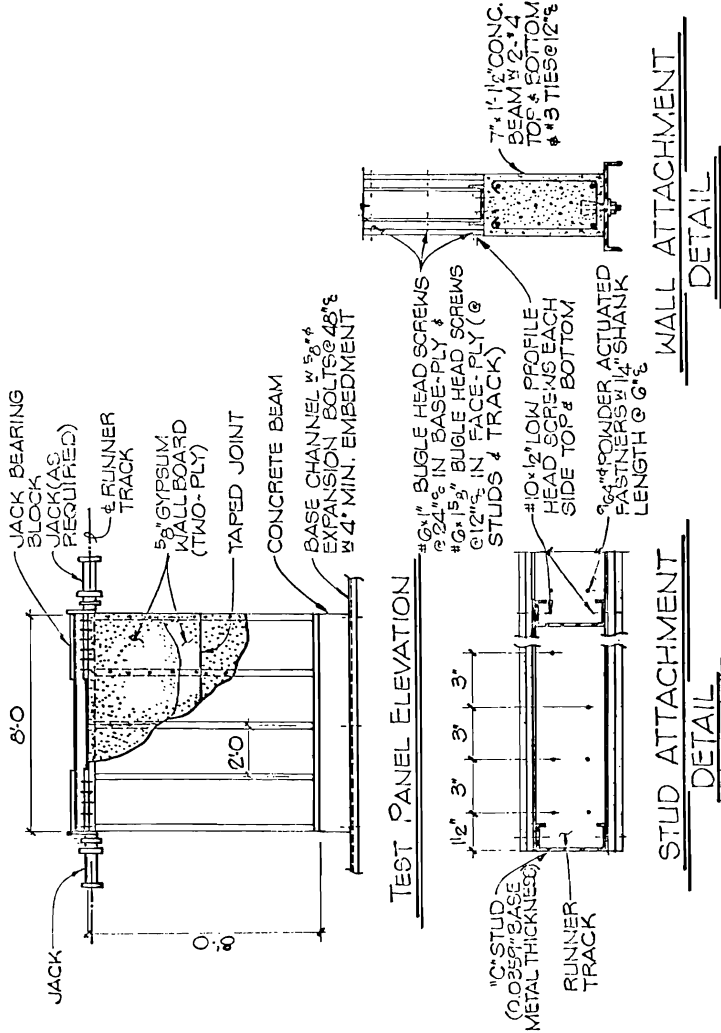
Test Assembly Plan & Details - Wall Type "I"
